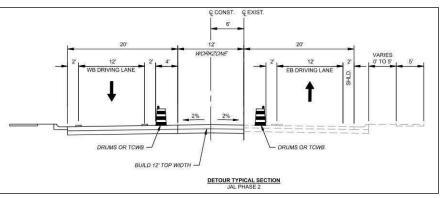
B. NM 128 MOT Typical Section – Jal Three Lane Construction
